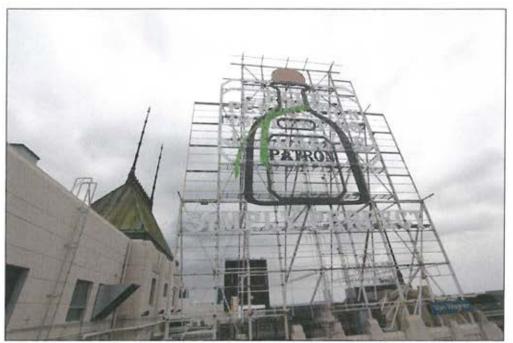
Bank of Hollywood / Equitable Building, roof with sign structure and penthouse, view south (Chattel 2014)
